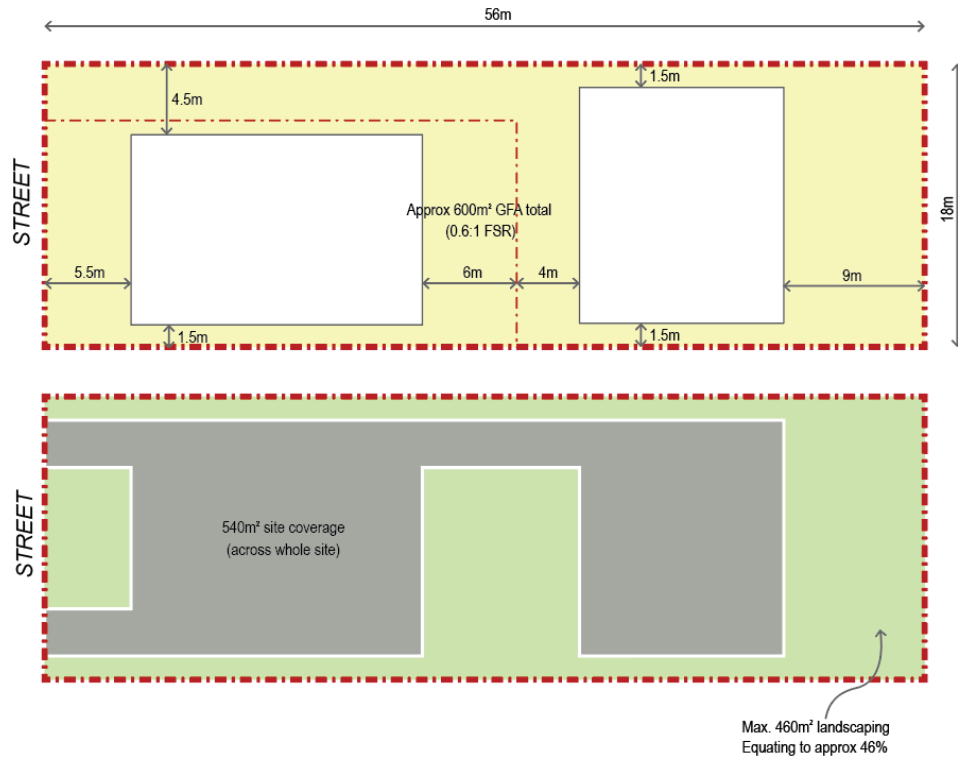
Plan of two storey dual occupancy (side by side) on a 1,000sqm site (FSPA)
